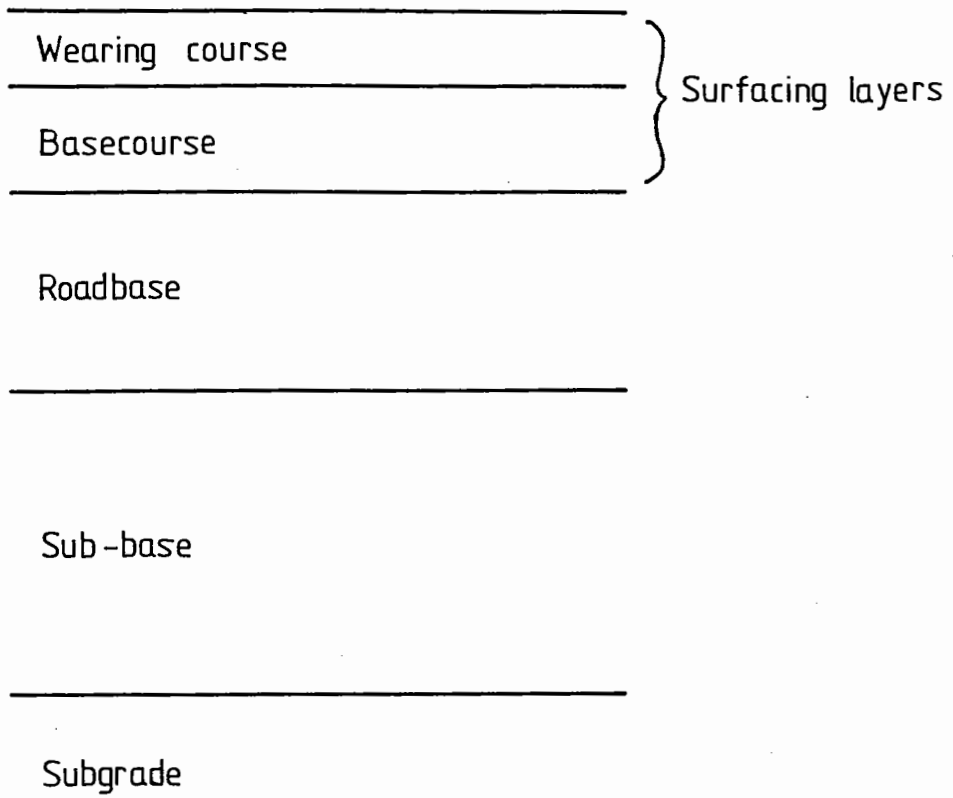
TYPICAL FLEXIBLE PAVEMENT
